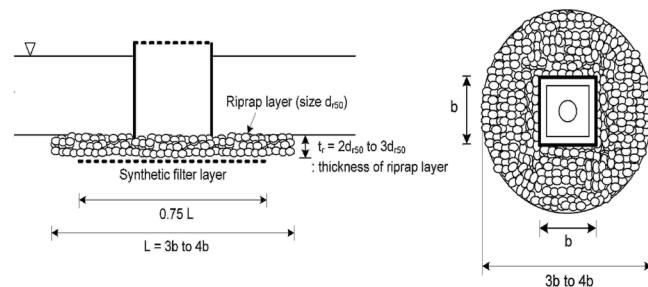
The example of recommendations for riprap replacement at bridge piers.
